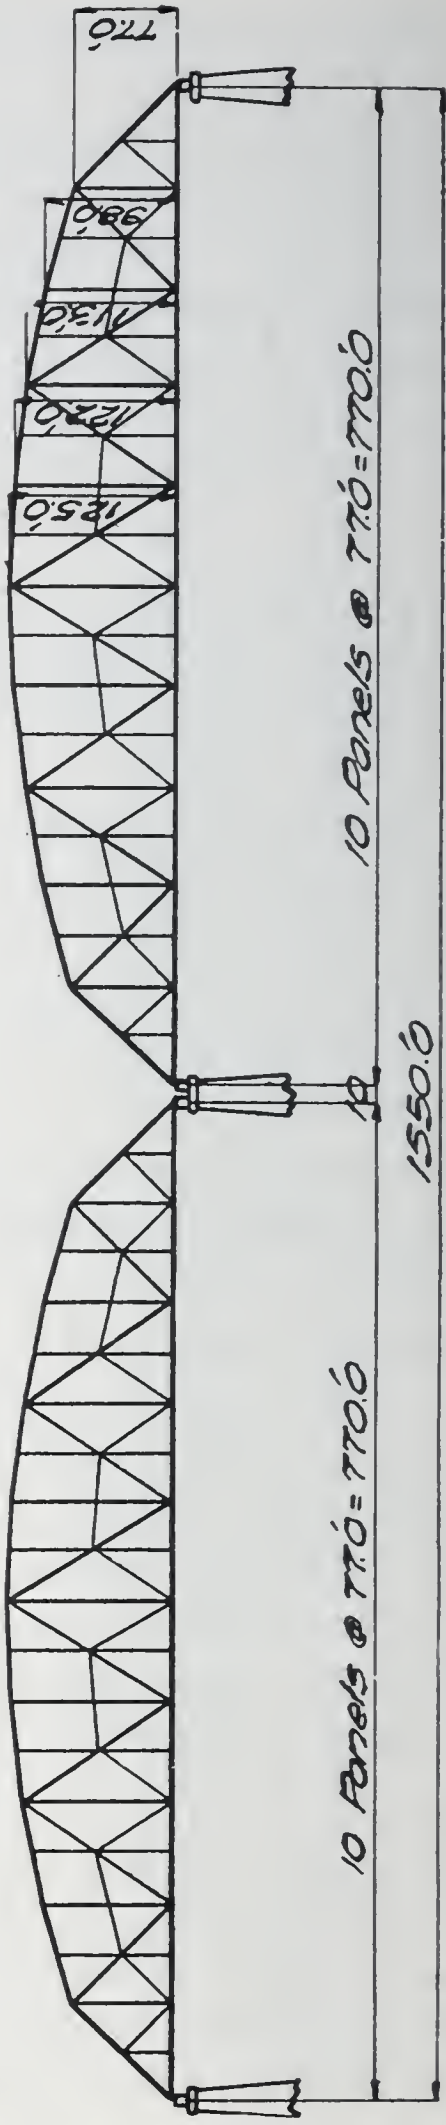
Lay-Out of Subdivided-Triangular Truss, Non-Continuous Spans.
